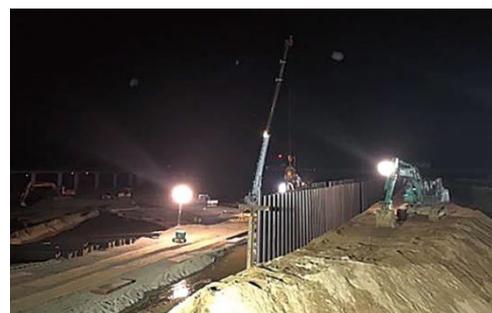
Completion status of steel sheet pile double cofferdam¹⁸⁾
